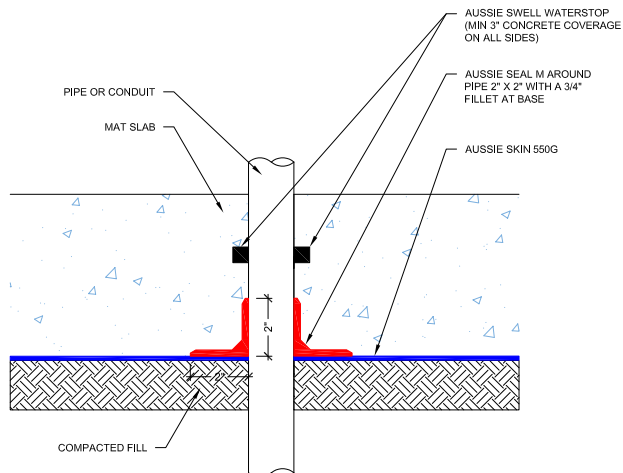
TYPICAL SLAB PENETRATION DETAIL
